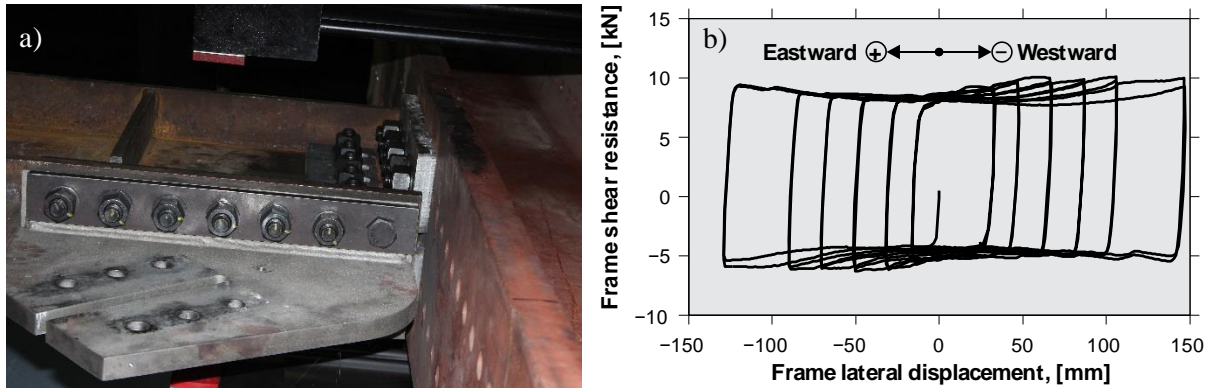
a) Close-up view of the loading frame gusset plate, b) lateral response of loading frame without BRB specimen.
